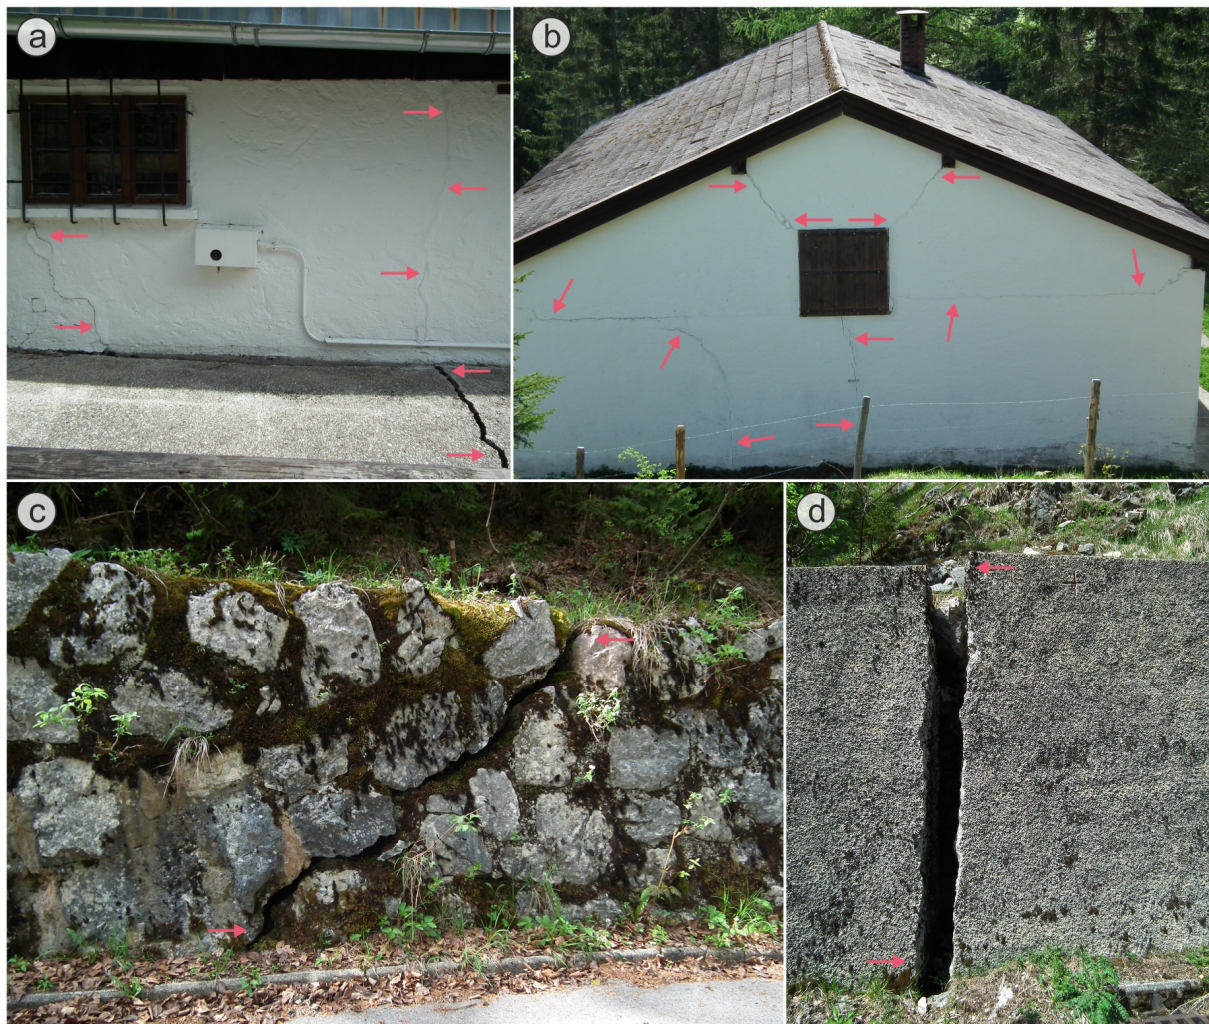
Exemplary damages at structure works inflicted by the movements of the landslide. The pink arrows point toward cracks and fissures within the structures. a) Detail of the southern wall of the Lampl Alm (hut No. 2). Some of the cracks have been recently painted over. b) Western wall of the Aggenalm hut (No. 1). Only the major cracks, opened up to 2.5 cm, have been marked. c) The crack in the natural-stone wall at the connection road to Oberaudorf has an opening width of 5–10 cm. d) Crack in the retaining wall at the road leading to Grafenherberg. It is about 16 cm wide.
